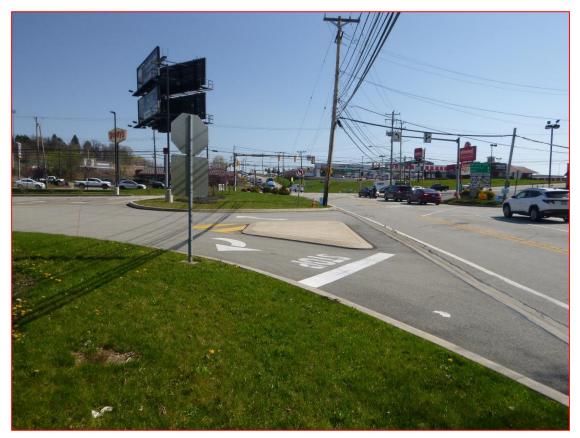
Jacks Run Road driveway to Getgo – Facing Northeast (04.12.2023)
